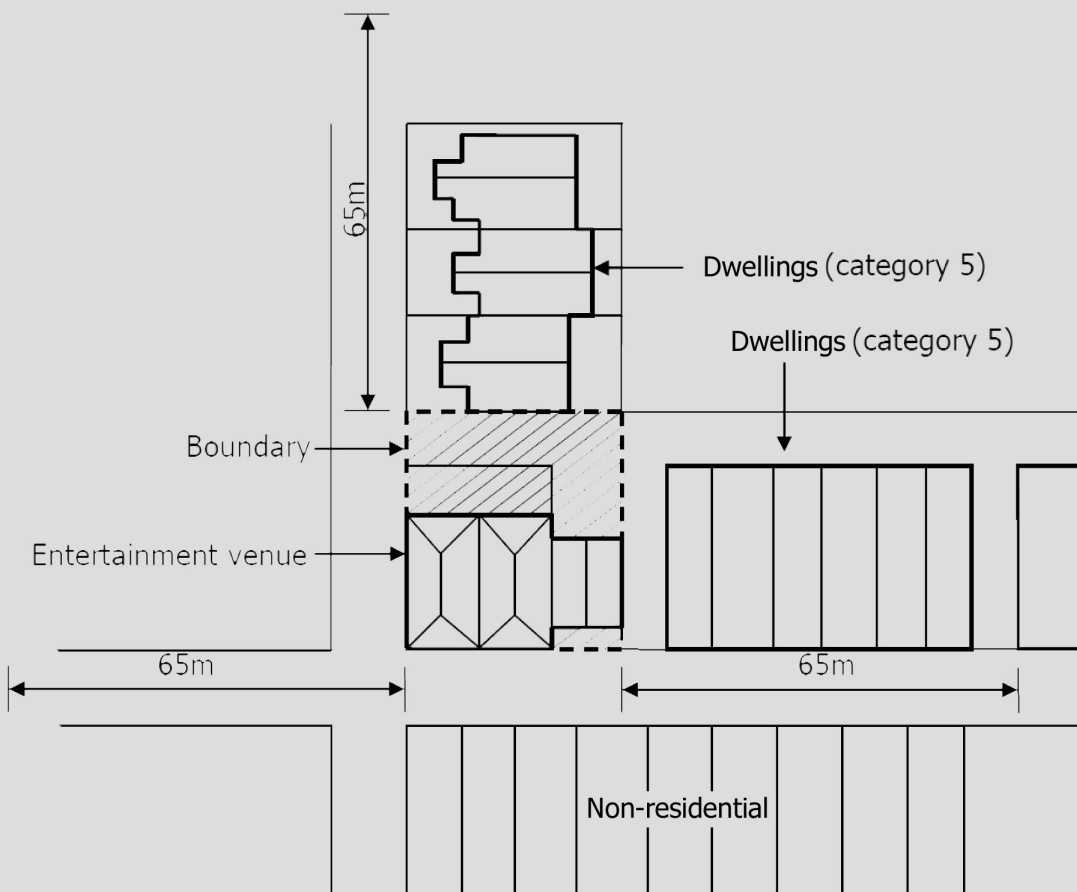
A plan showing the applicable *separation distance* for an *entertainment venue
